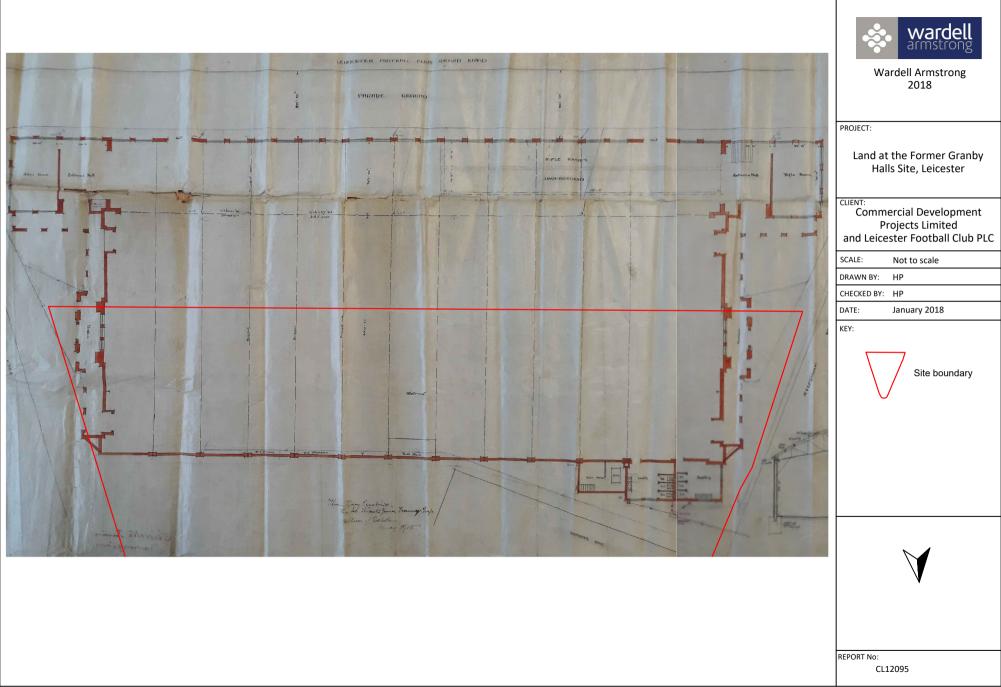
Plan of Proposed Junior Training Corps Drill Hall, 1915.
